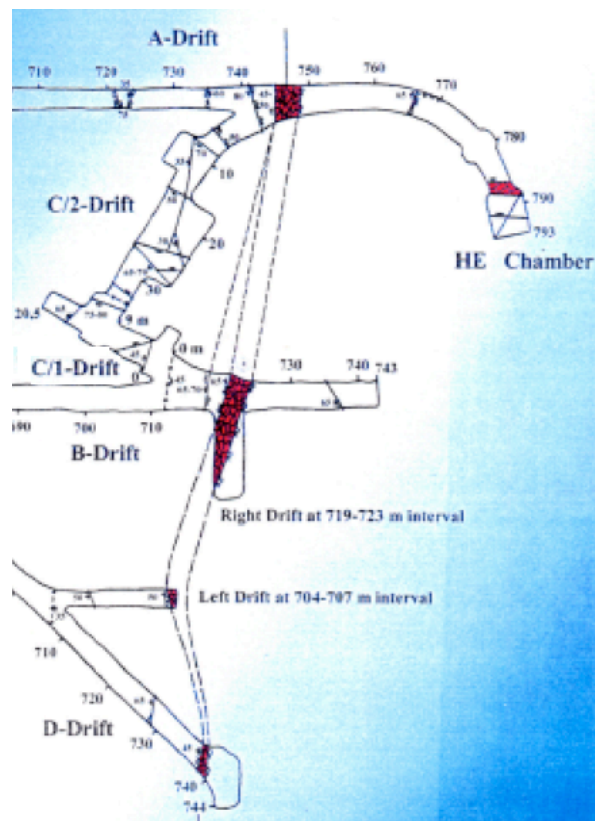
Layout of a HE test in a tunnel complex in Kazakhstan [7]
